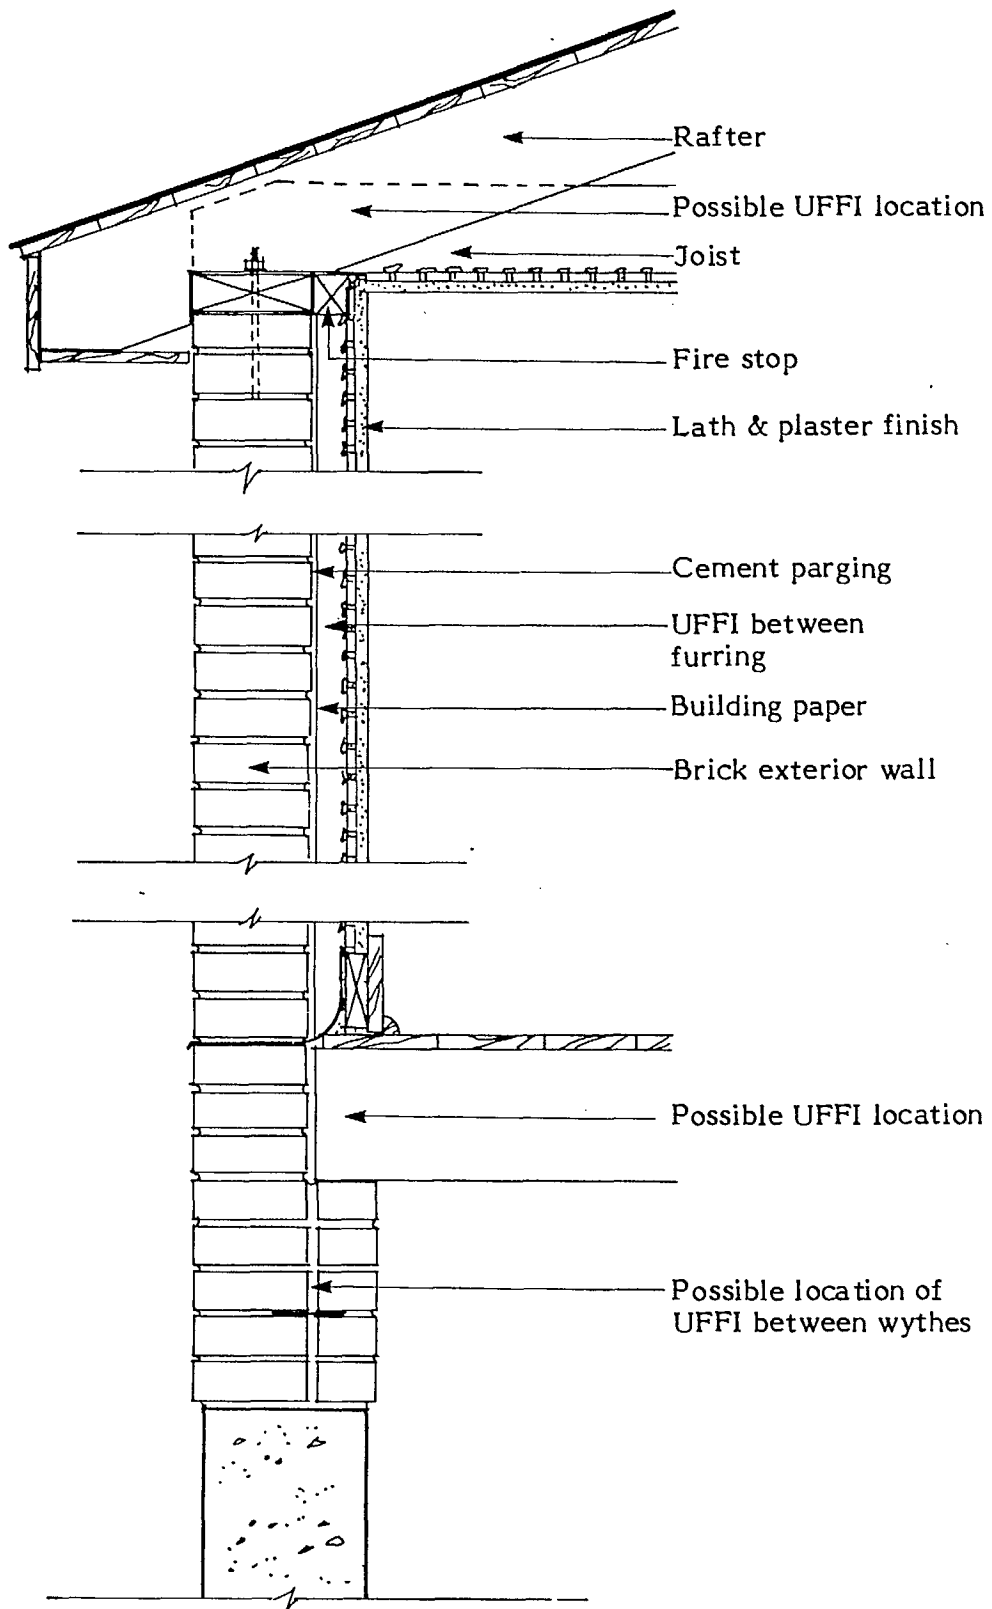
THROUGH-THE-WALL (TTW) BRICK CONSTRUCTION
